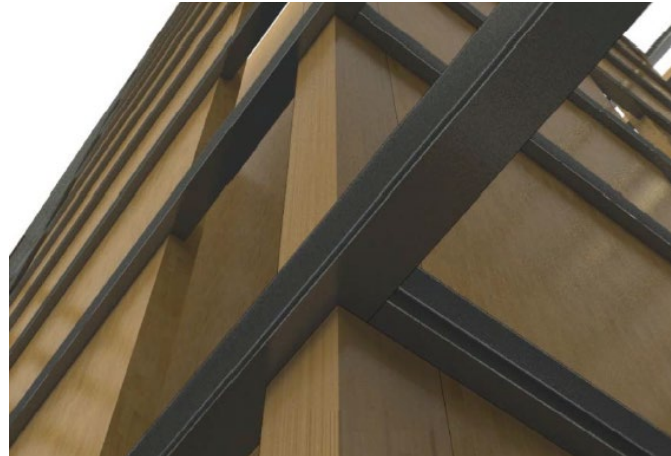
Continuous posts in a mid-rise wood building Fondaction CSN Building, Québec.
